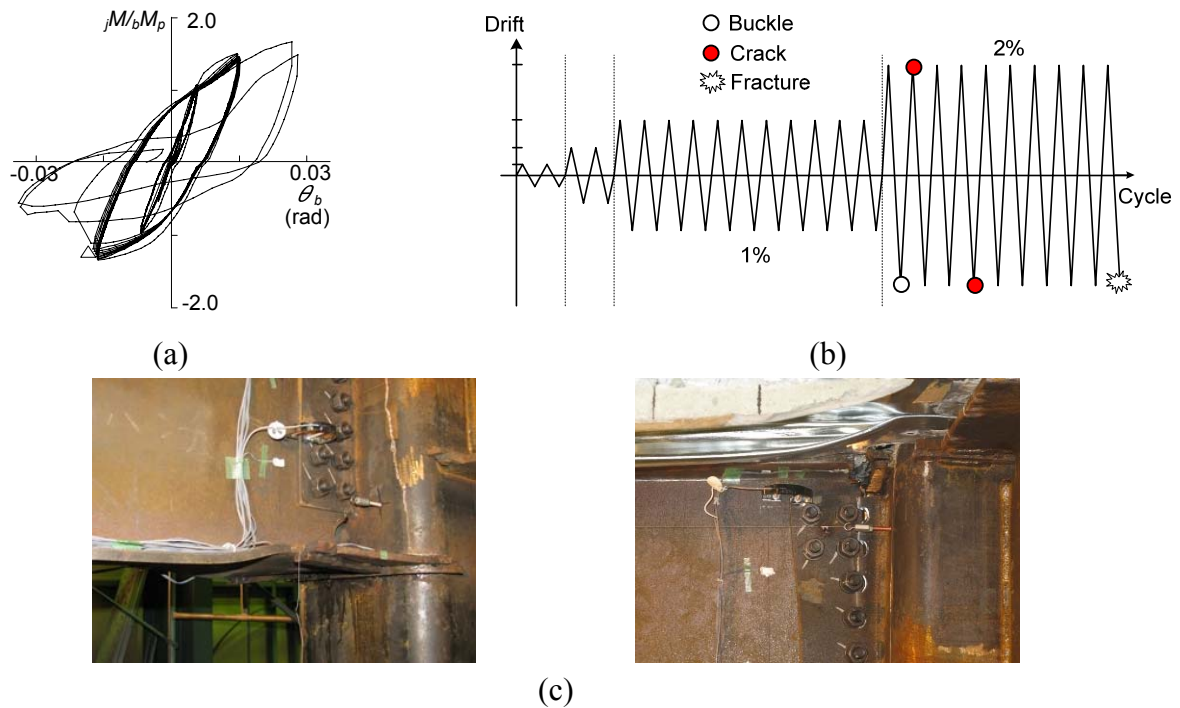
Test result of wing plate connection: (a) Moment and rotation relationship; (b) Loading history; (c) Local buckling and fracture
